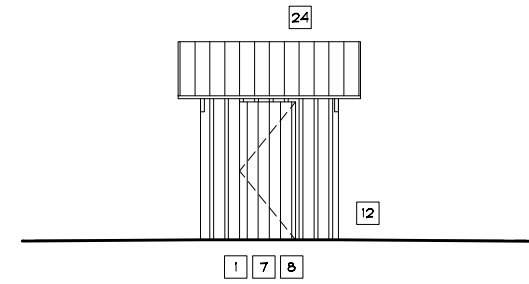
through 181 show the existing conditions of the Caretaker's Outhouse.
